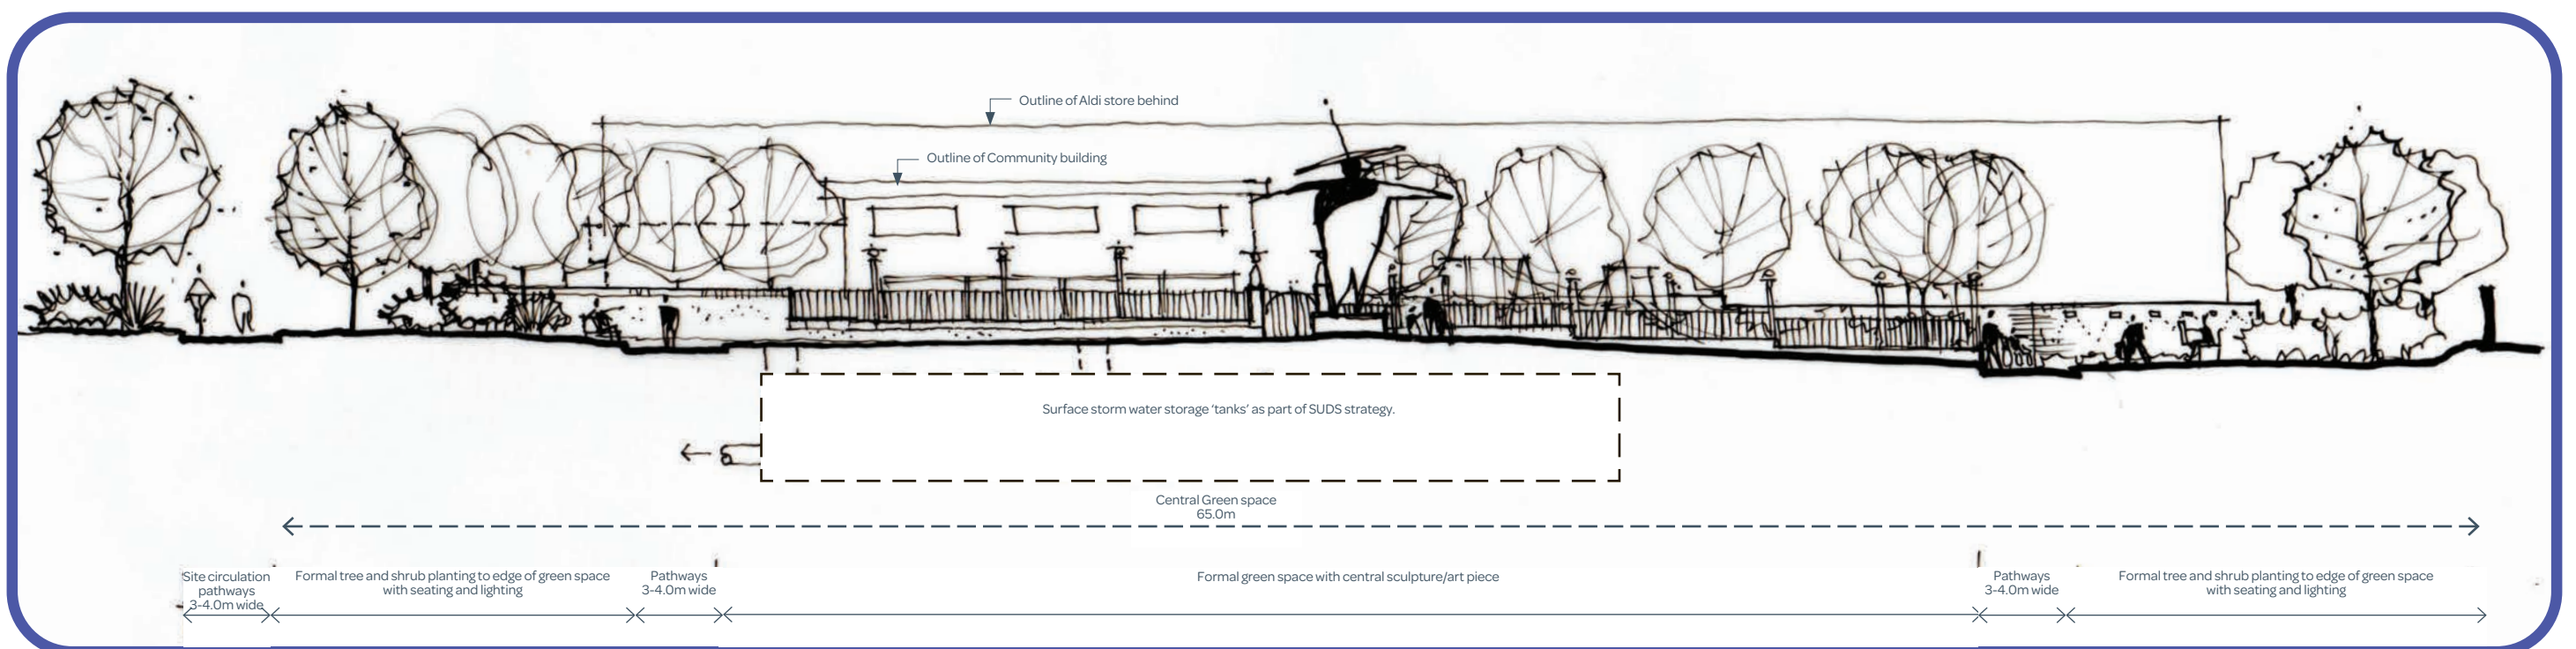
SECTION D D' - Indicative long section through proposed Central Public Open Space looking north
